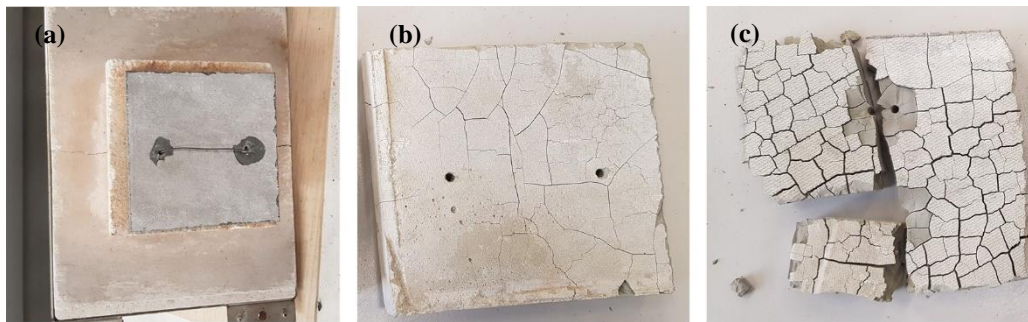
Small-scale fire resistance tests: a) specimen before the test ; b) heat-exposed face of TW6L specimen after the test; c) heat-exposed face of CTR plate after the test
